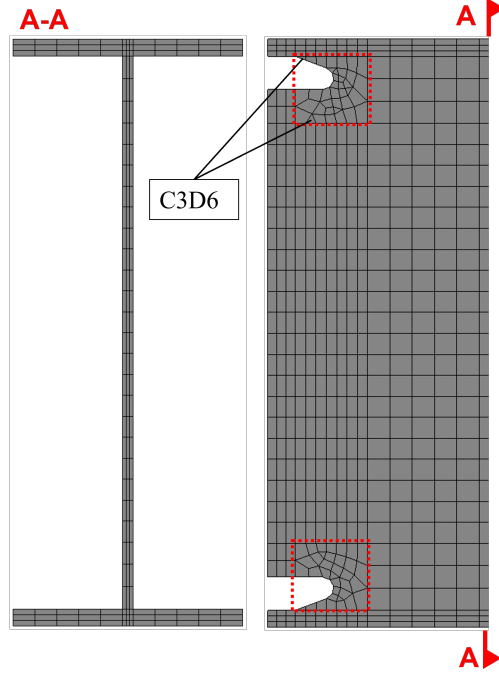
Beam cross section mesh (W 21 x 62) on the left. Elevation view of the member, location of triangular prism element (C3D6)
